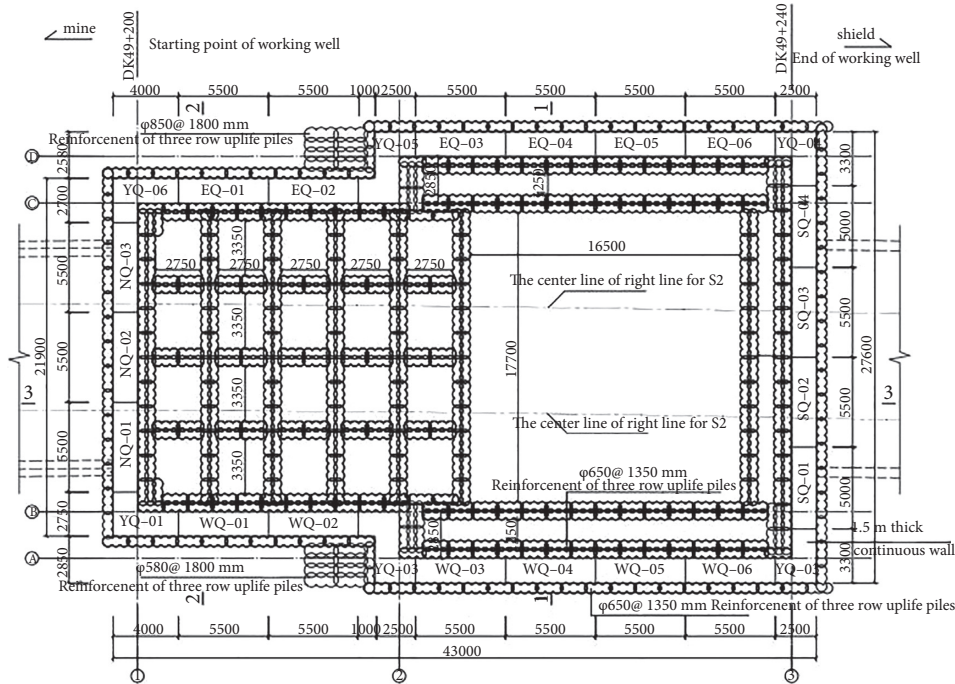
Division map of ground connecting wall in Jiangbei working well.
